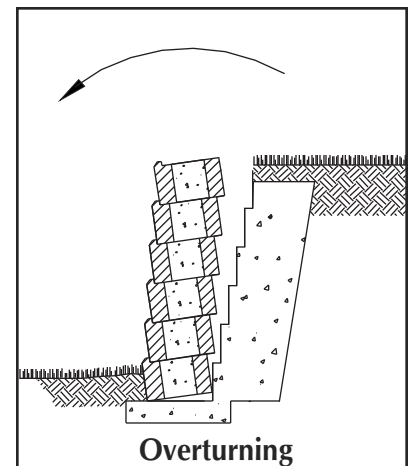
Schematic Diagram of Simple Gravity Retaining Wall
